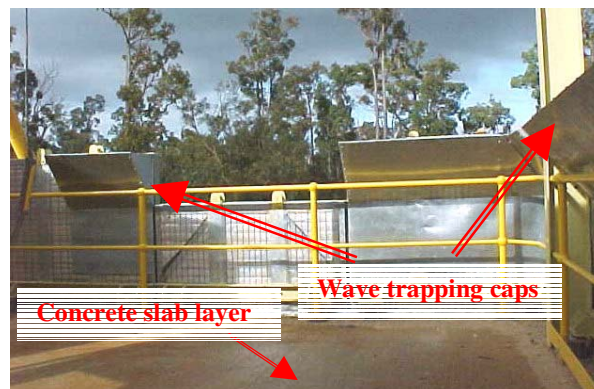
Noise control panels and wave-trapping caps and floor treatment on the top floor.
